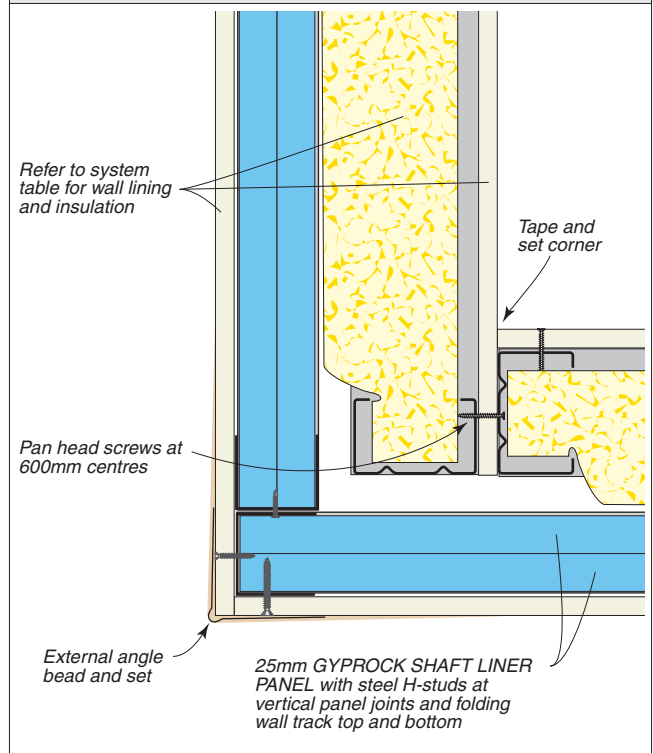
CORNER DETAIL FOR STRATAWALL™
